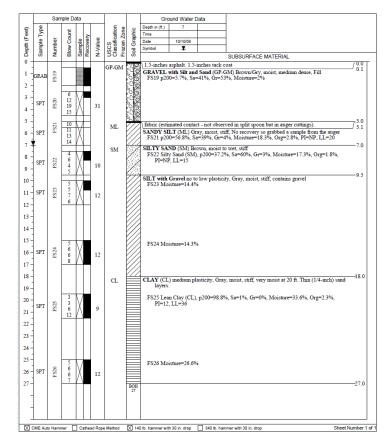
Geotechnical Report from ADOT at bridge location (ADOT, 2008).
